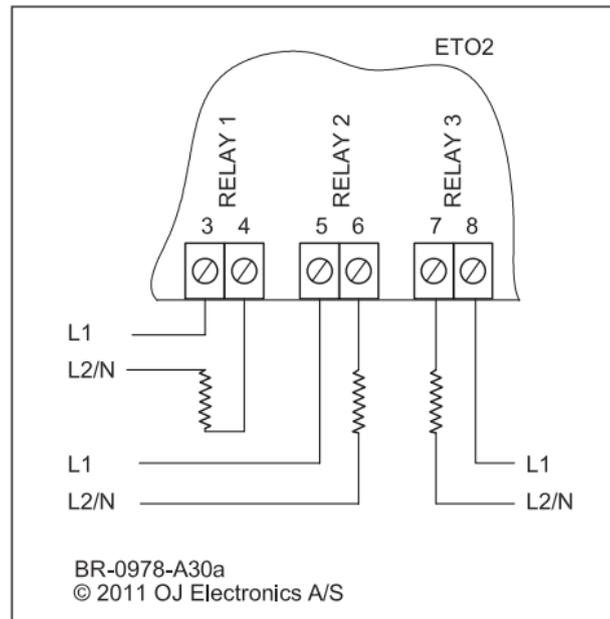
Advanced 2-step with ETOG-55. 1/3 power on heating cables in afterrun.
